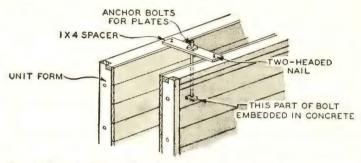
Form for Holding Foundation Anchor Bolt in Place Prior to Pouring of Concrete
